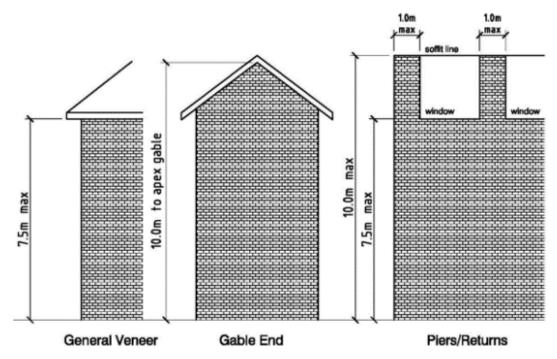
Maximum Veneer Heights for two-storey stack bond construction – diagram sourced from Clay Brick & Paver Manufactures association
